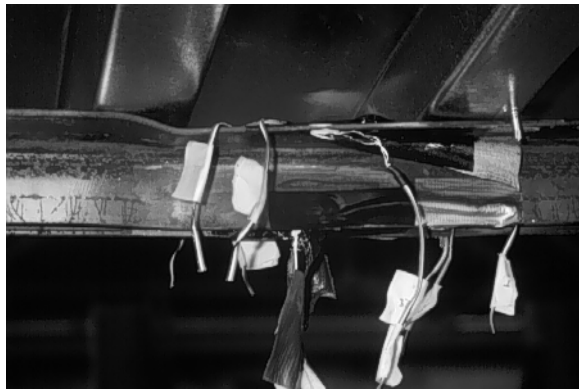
Failure Mode for 16K2-PW-1 West Joist
